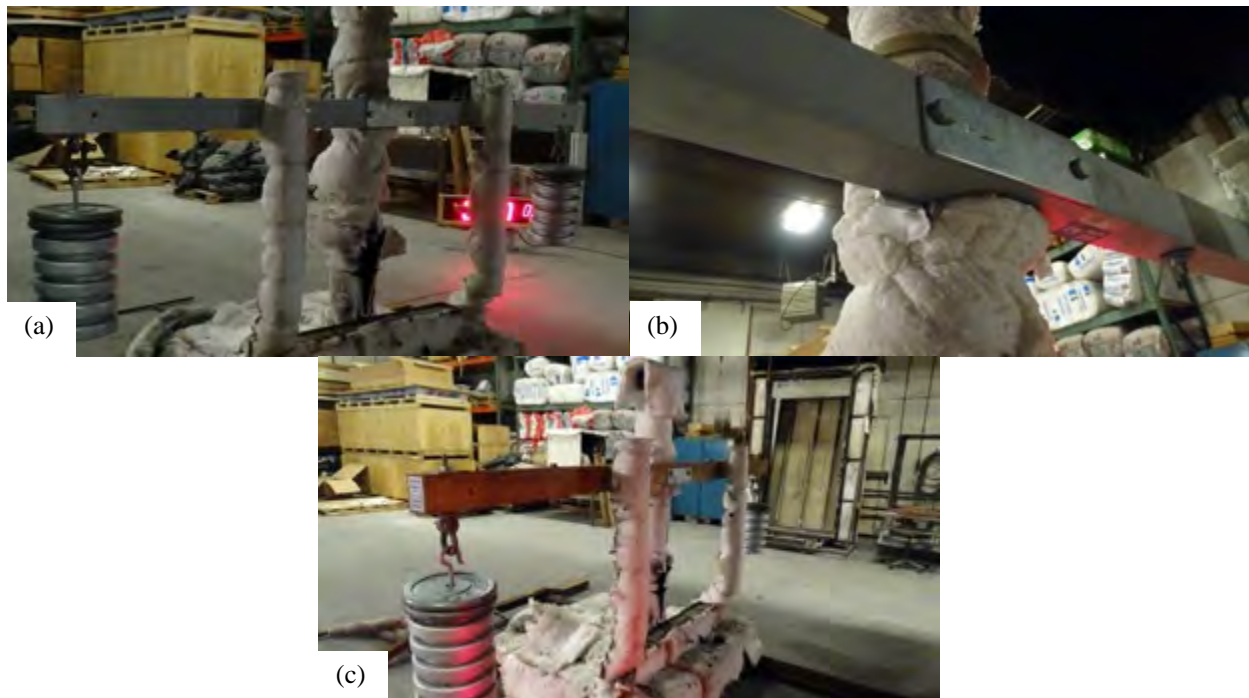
Representative crossarm samples before testing showing (a) Test 1, (b) Test 1 fixture, and (c) Test 2.
